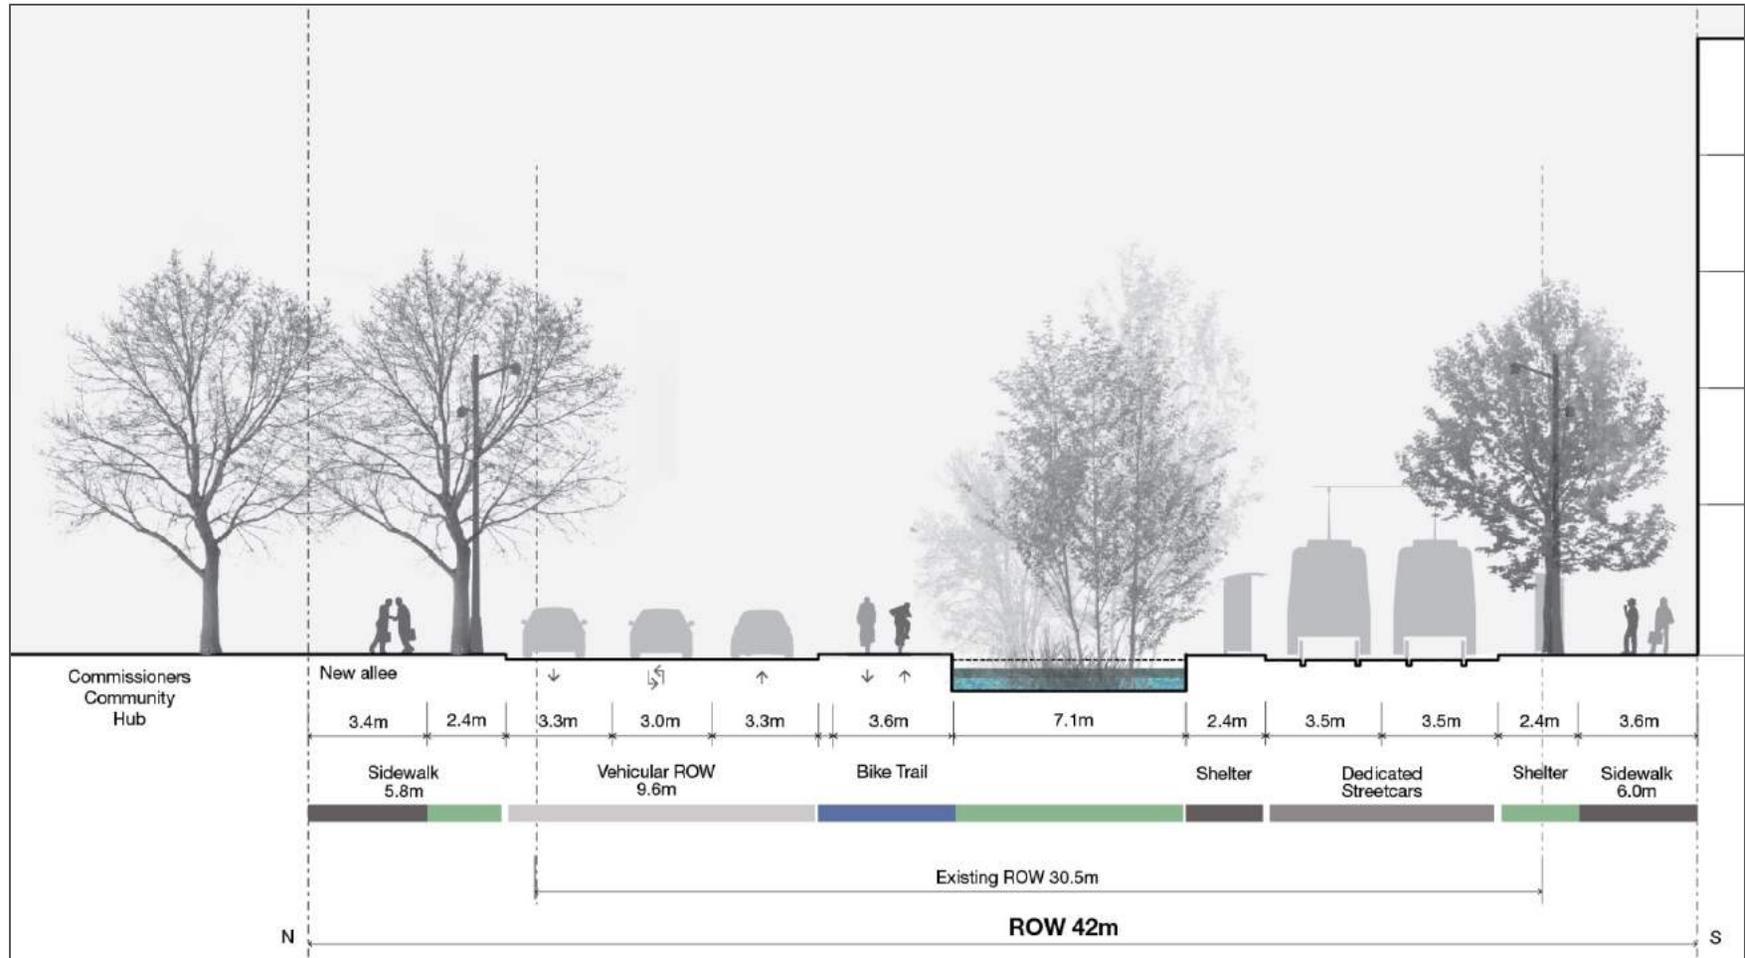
CONCEPTUAL CROSS-SECTION – COMMISSIONERS STREET, TURNING BASIN
